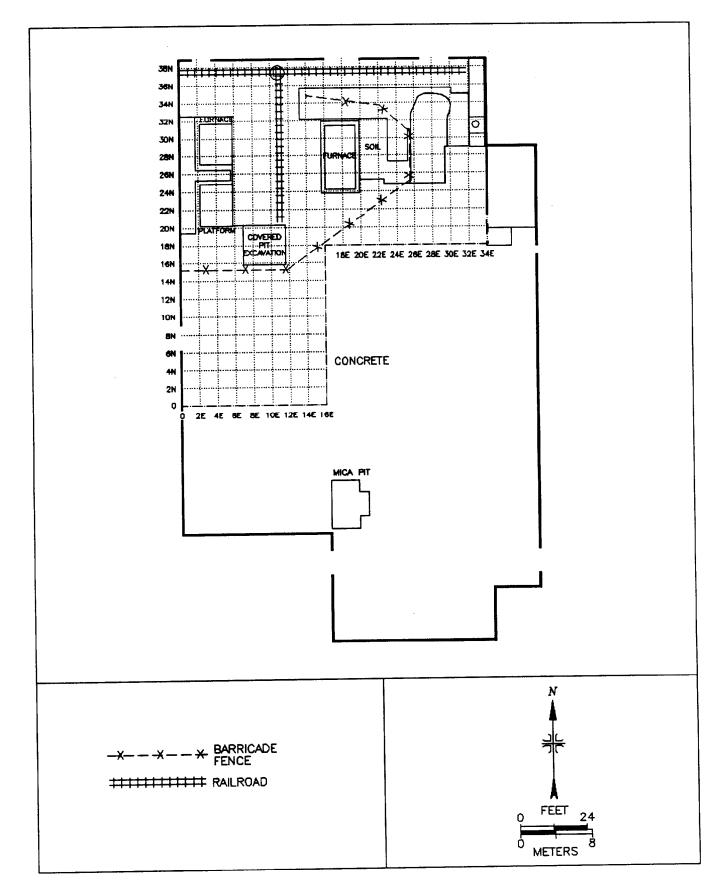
Floor Plan of Building 3 - Reference Grid
